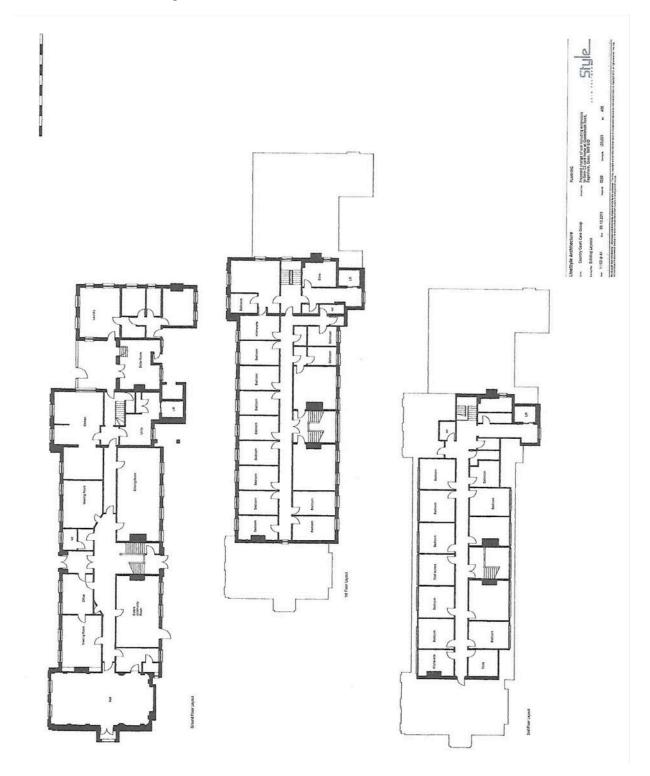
existing plansDrawings taken from http://paplan.lbbd.gov.uk/online-applications/applicationDetails.do?activeTab=documents&keyVal=NW5FLBBL50000
